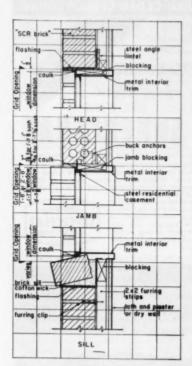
Steel residential casement window without surrounds and with interior metal trim. This detail is applicable to standard steel casement widths of 1' 71/s", and 2'
